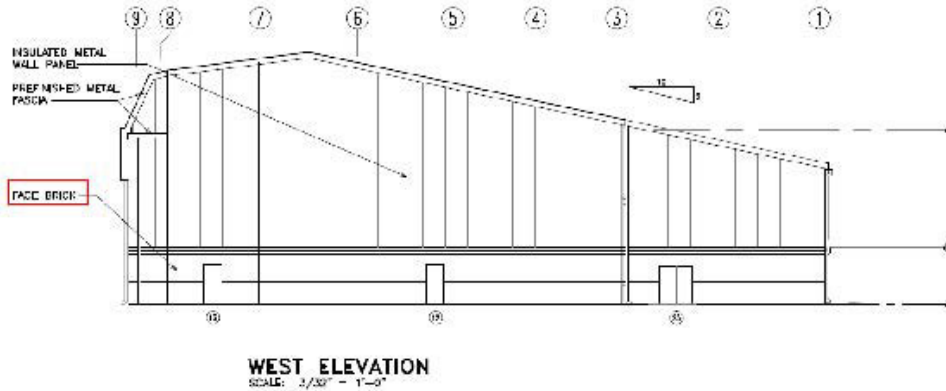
Image showing the proposed configuration of the southwest elevation. The note indicated in red, which is shown on the 35 percent design plans, indicated that brick veneer would be installed; however, that design element has been removed to avoid impacts to the historic property. Note, no change is proposed to the roof pitch. Due to the 3D/2D nature of the above two images, it gives a false appearance that the roof pitch would change.
